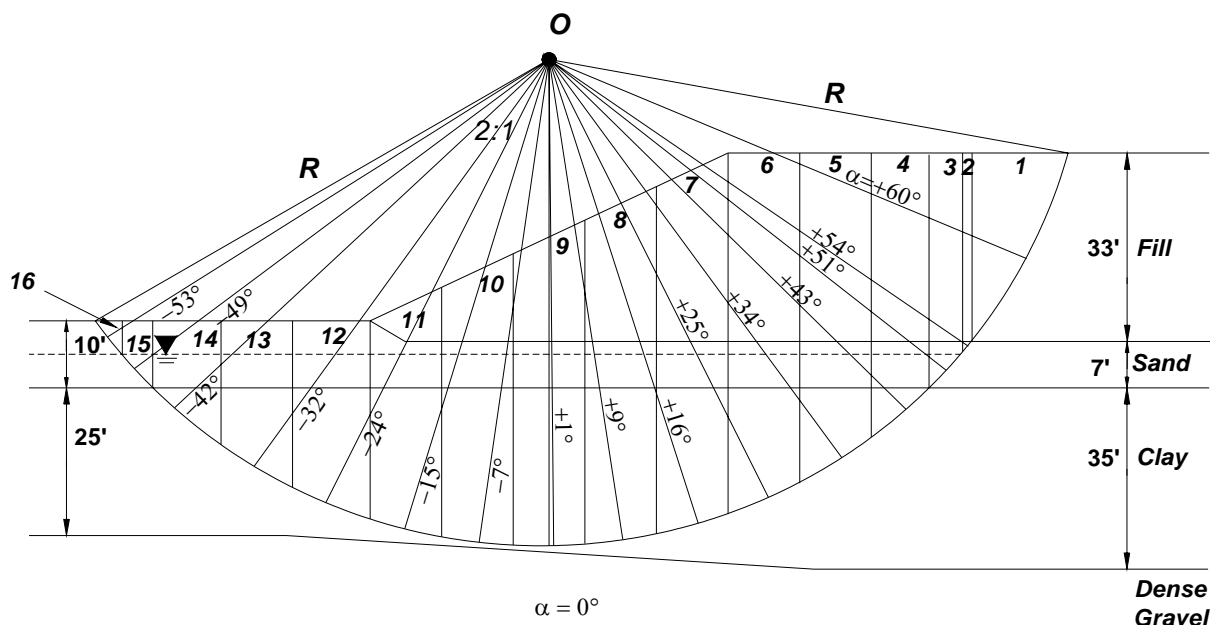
Determination of α – Angles corresponding to each vertical slice above assumed failure arc – East Abutment.
